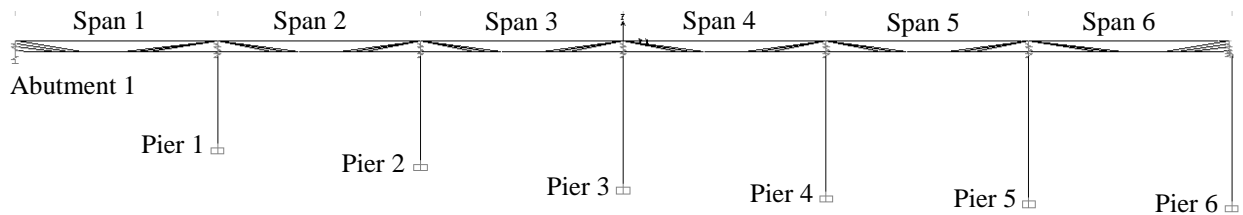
Varina-Enon Bridge Beamline Model – Elevation View
